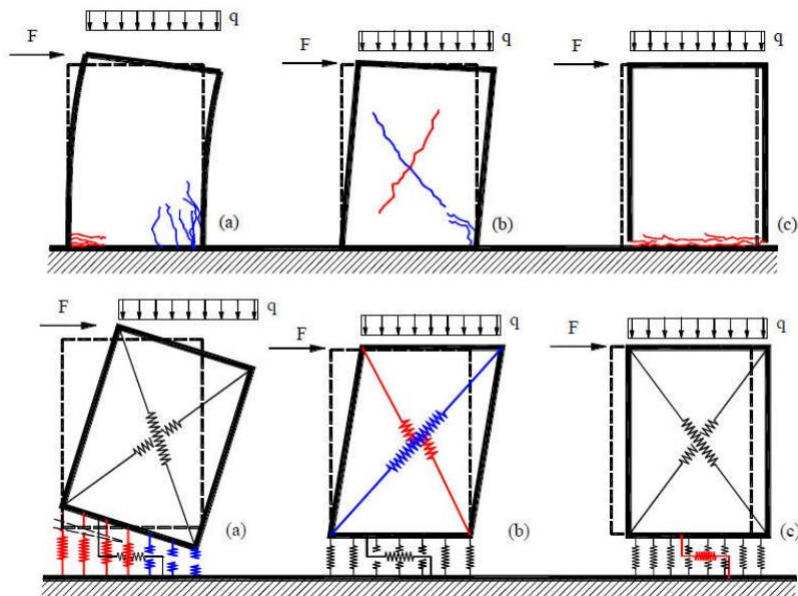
(top) In-plane failure mechanisms; (bottom) simulation of in-plane failure mechanisms. a) crushing failure/tension cracks; b) shear-diagonal failure; c) shear-sliding failure (Calio et al., 2008).
